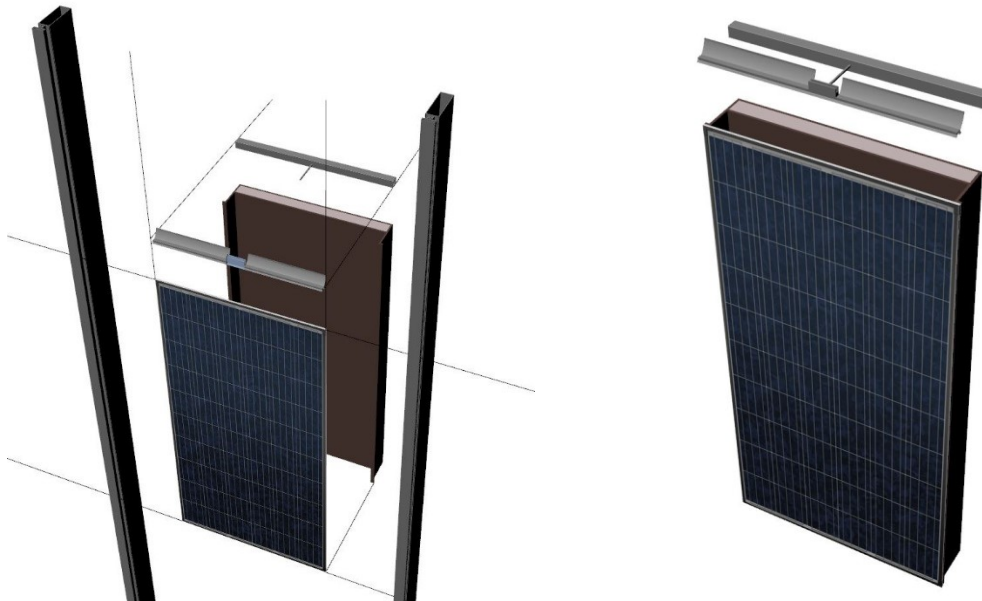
Components of a unit in a unitized system (left) and unit and horizontal cap prior to install (right)
